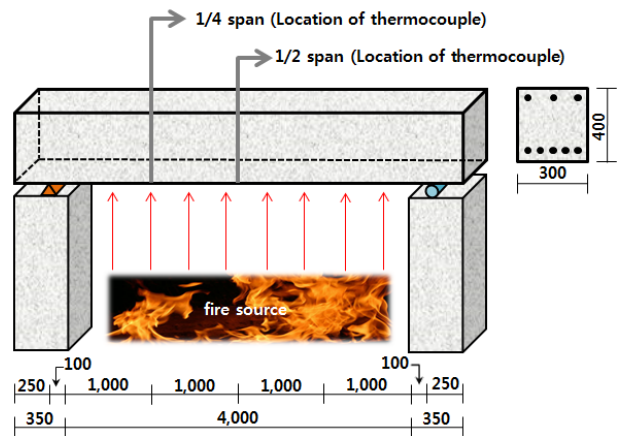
Dimension of concrete beam to be fire-exposed(unit : mm)
